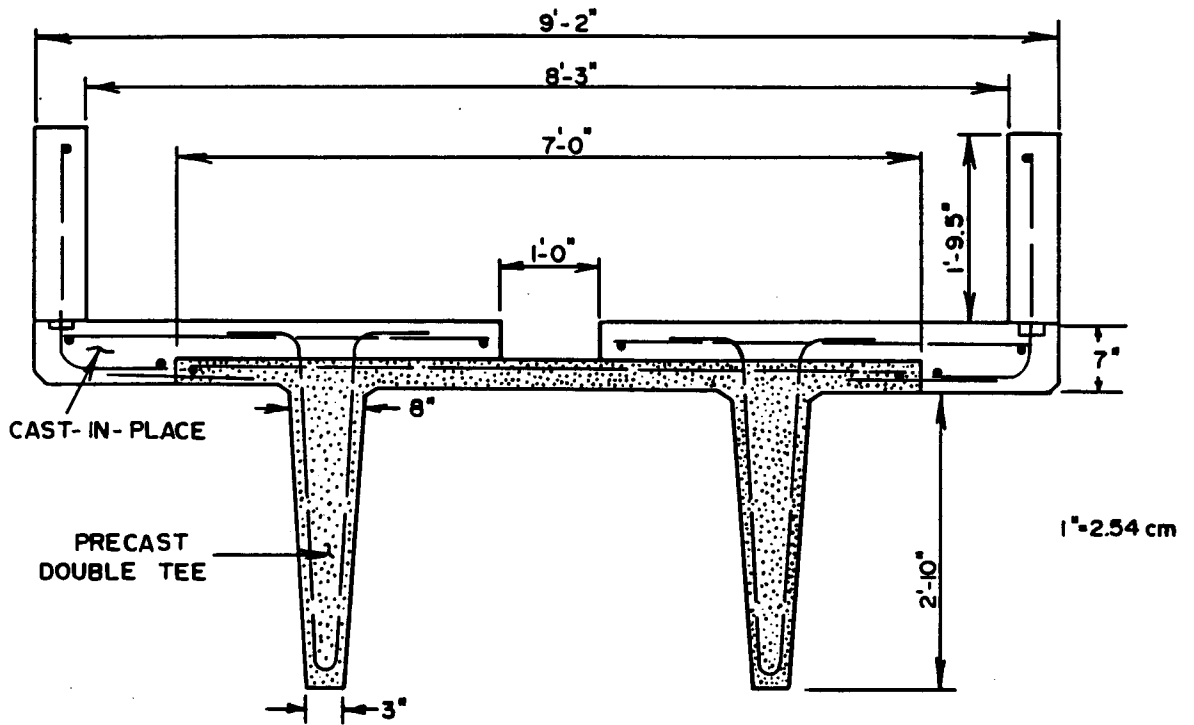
Cross section of the Duke University Medical Center elevated guideway
